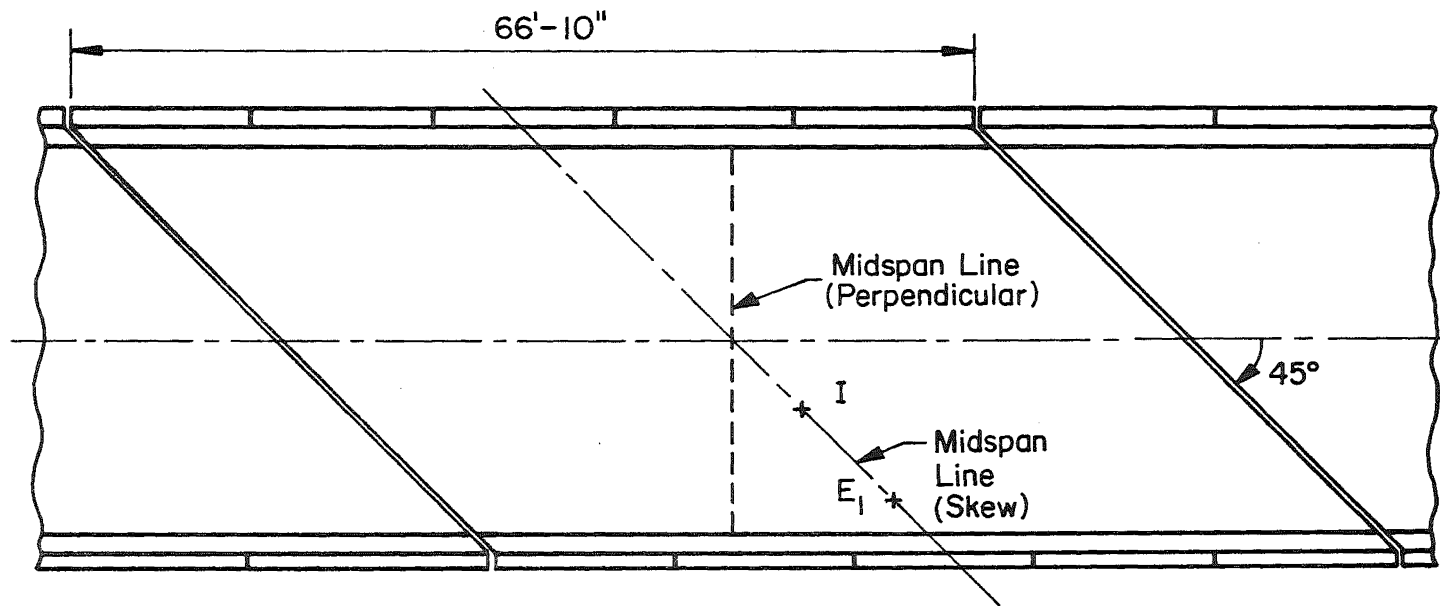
Plan of the 45<sup>0</sup> Skew Spread Box-Beam Bridge - Brookville Bridge
